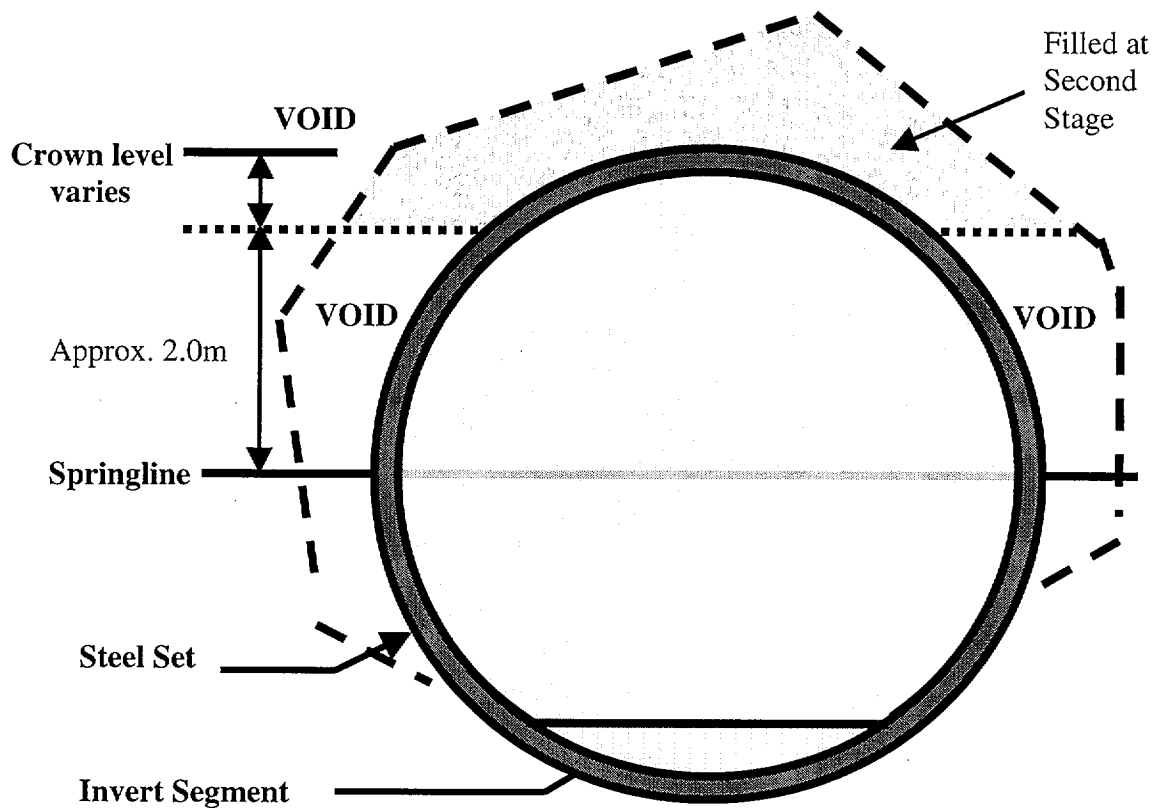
Typical Construction Form that May Be Used in 3.01.X Areas for Shotcrete/Concrete Backfill
